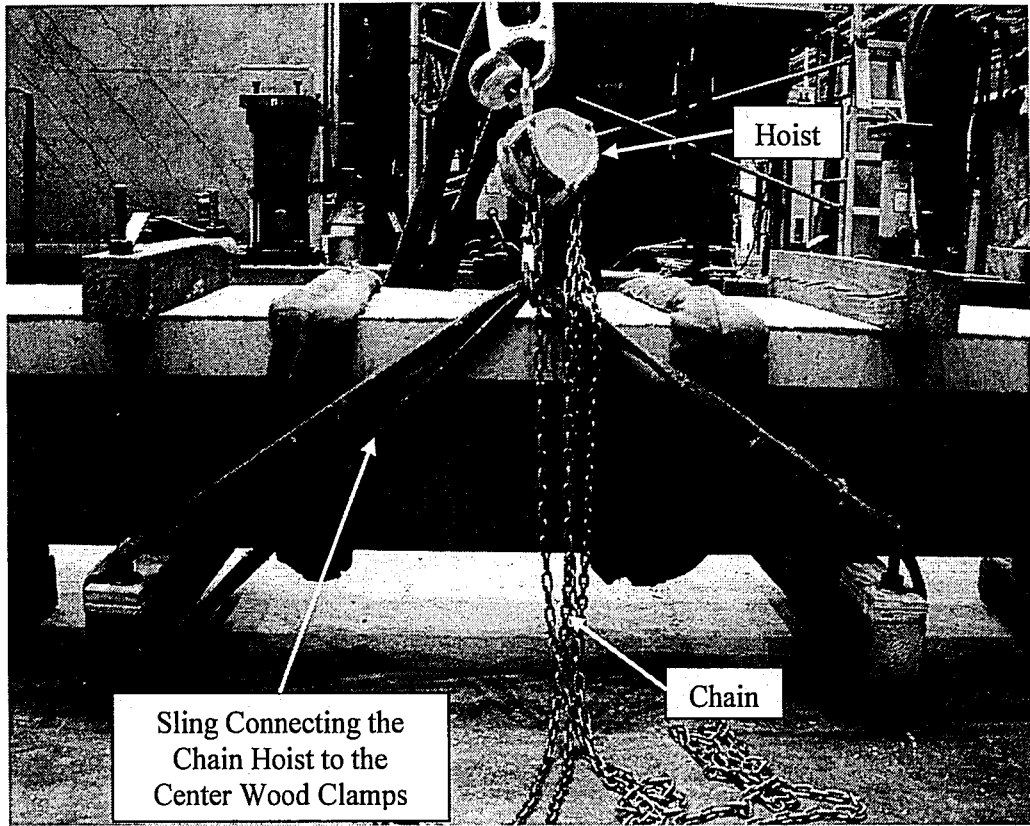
Close-Up View of the Hand Chain Hoist Connected to the Test Specimen
